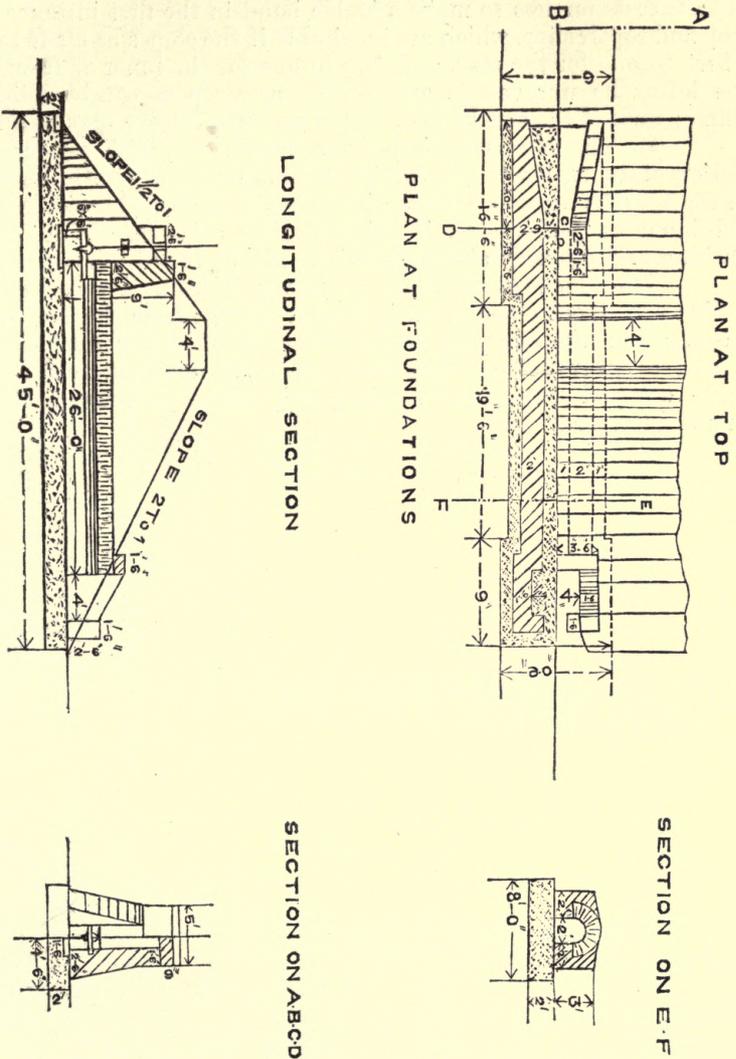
Tank Sluice. Arched Tunnel with Plug.
